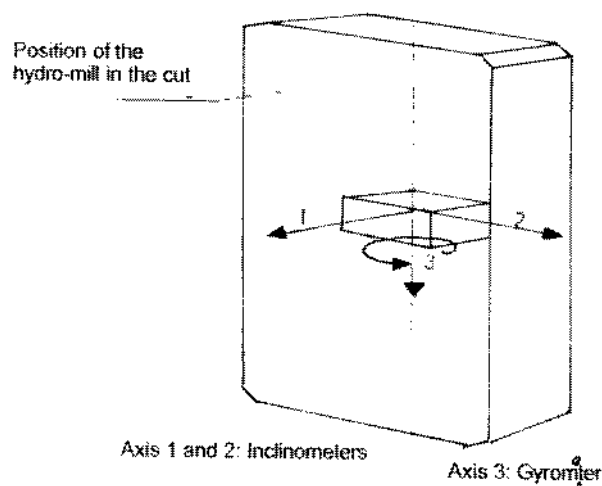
Position control of the hydro-mill (online) (Solétanche-Bachy)
